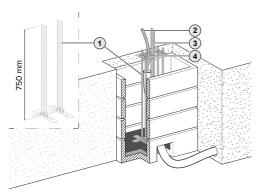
Insert the foundation fixing set including the foundation plate (example: AMEDIO®)
